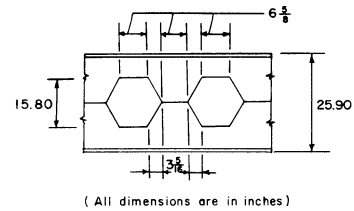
Specimen 2: Original beam W18×50, expanded to 25.9×50-3
